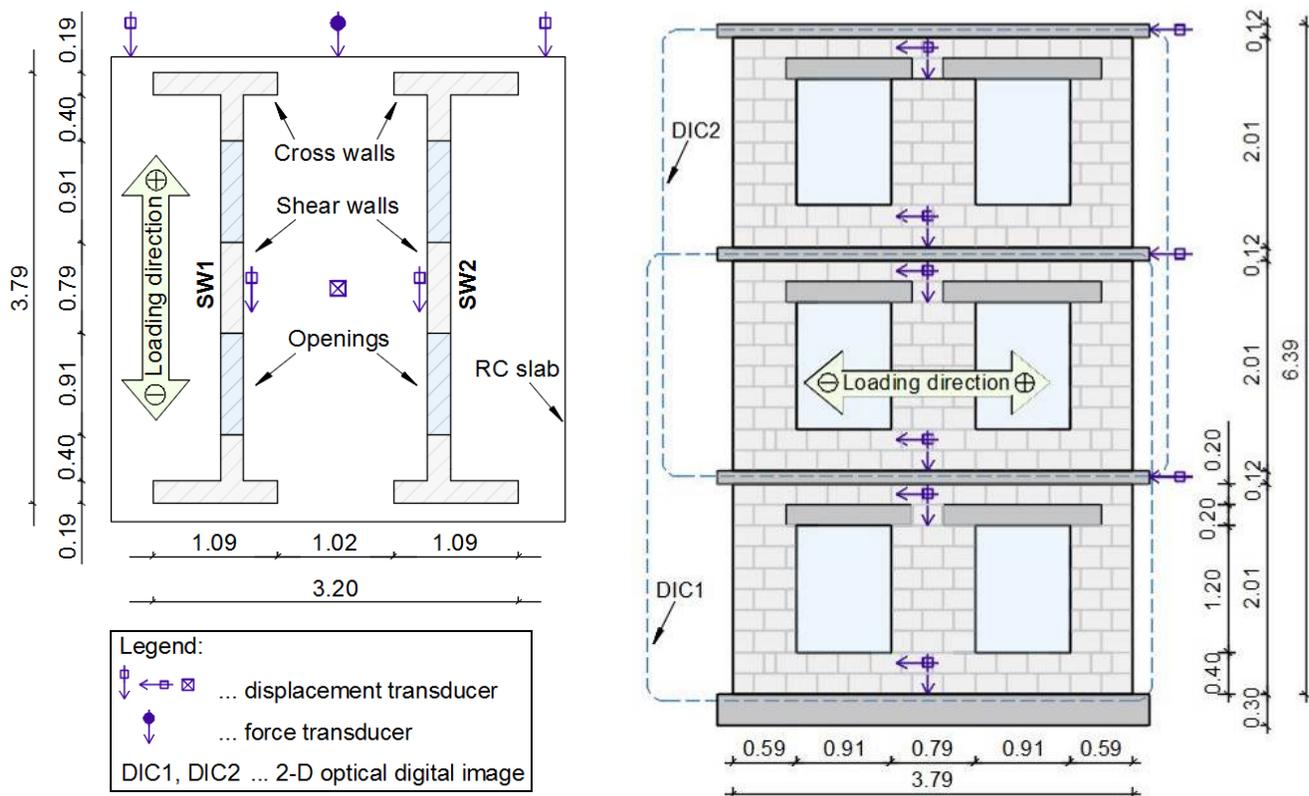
Disposition and instrumentation of the test specimen. Dimensions in meters.
